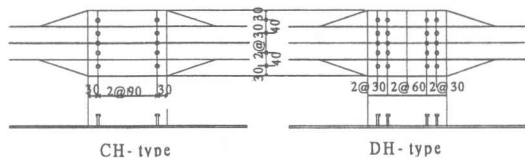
Arrangement of studs on the steel girder flange of the previous experiment of type CH and DH specimens
